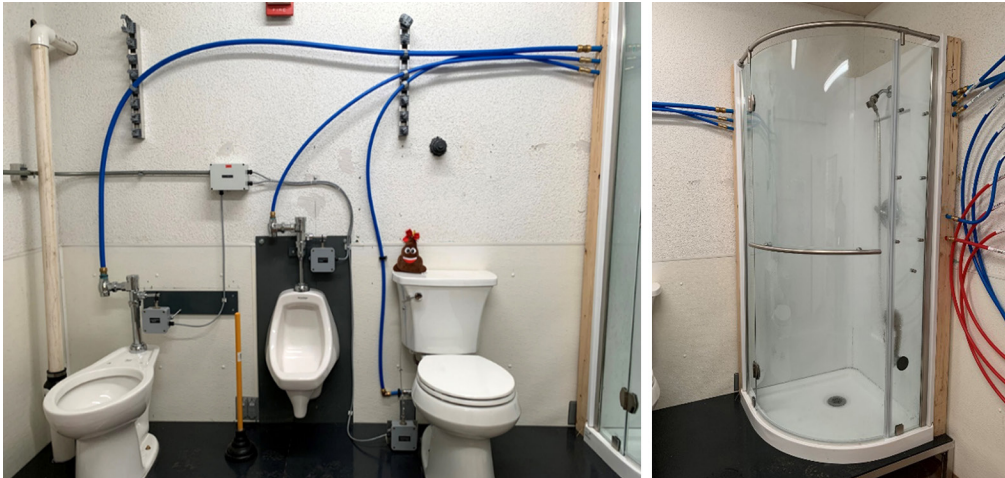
Full-Scale Premise Plumbing at the T&E Facility (2 of 2)
